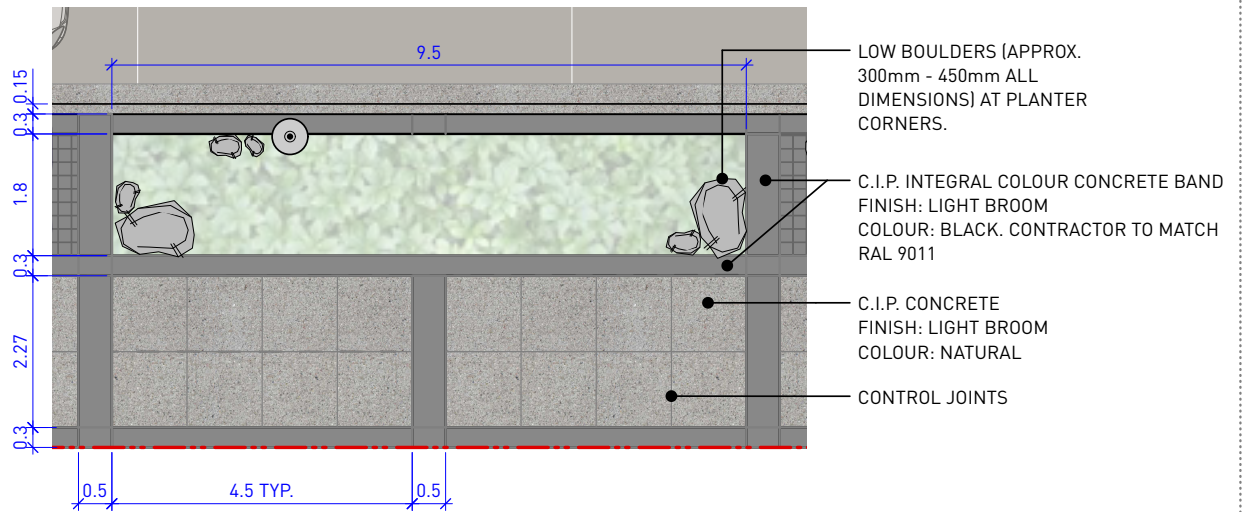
ENLARGEMENT 3 - PAVING AROUND PLANTER
